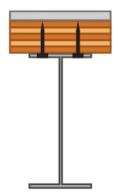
Steel-Timber Composite Section (Barber et. al, 2022) Copyright © American Institute of Steel Construction Reprinted with permission. All rights reserved.
